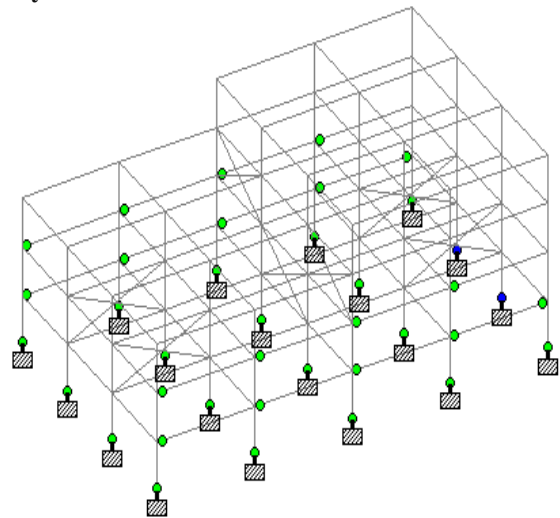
Members of Externally Braced Steel Frame in IO-LS
